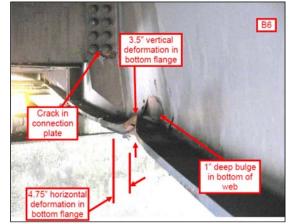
I-66 EB, Span 2 Beam #6, Bottom Flange Collision Damage
